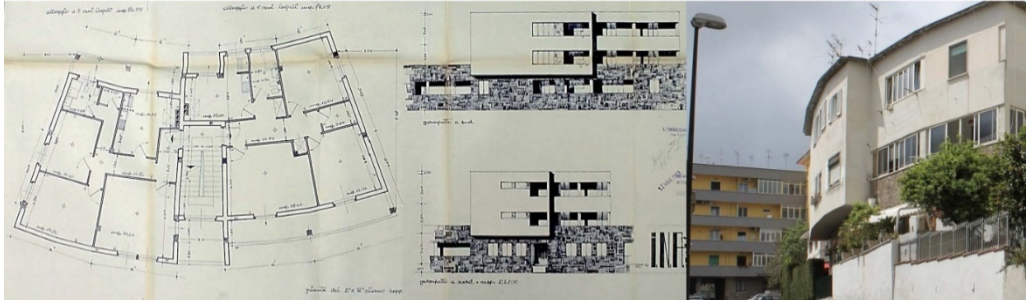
Stefania Filo Speziale, *Agnano*. Plan of the first and second floors (1:50) and north and south elevations (1:100) of a low building, 1953 (Archivio IACP Napoli); view of a low building and a "bridge building" in the background (photo by De Falco).
